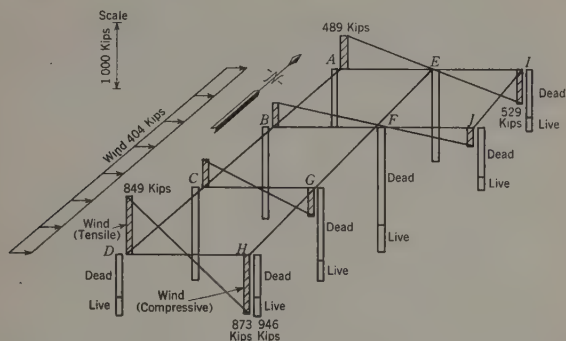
TOTAL COLUMN CHORD STRESSES AT BASE OF BUILDING, UNDER AN EAST-WEST WIND, DEAD LOAD AND LIVE LOAD
